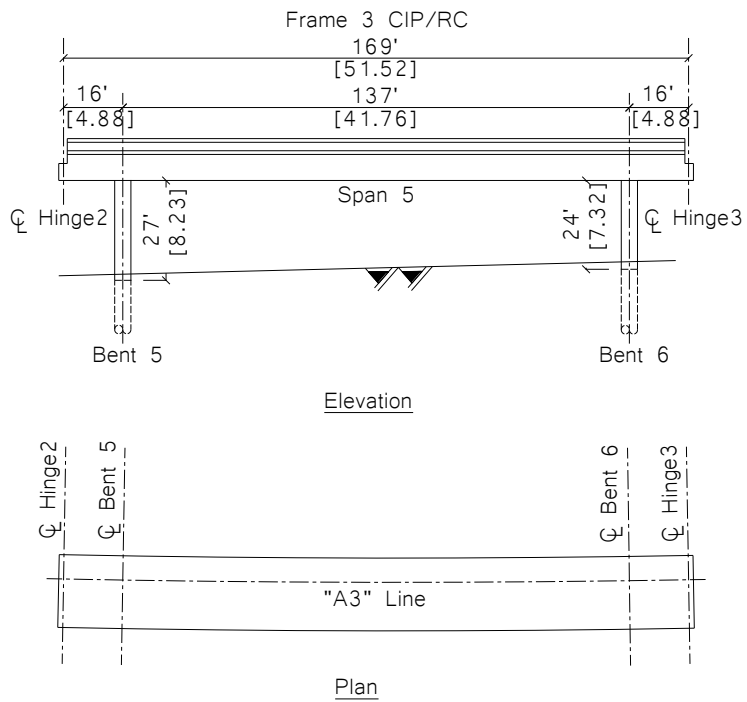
Elevation and plan views of Frame 3, Bridge 5WB
